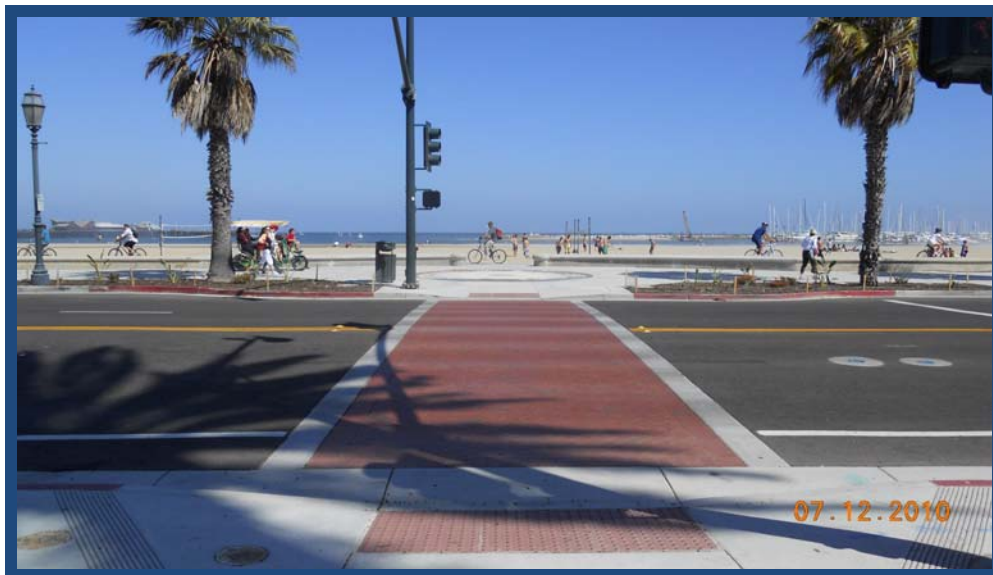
New Pedestrian Crosswalk at Ambassador Park
